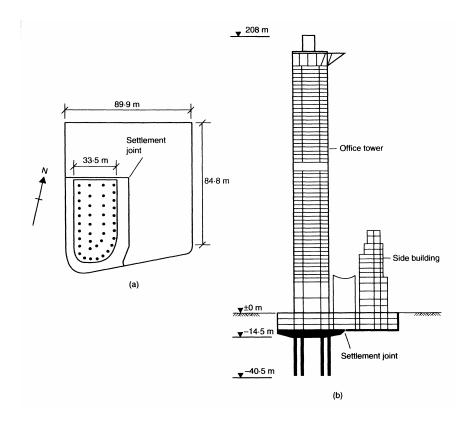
DG-Bank building: a) ground plan, b) sectional elevation (Katzenbach et al., 2000)
